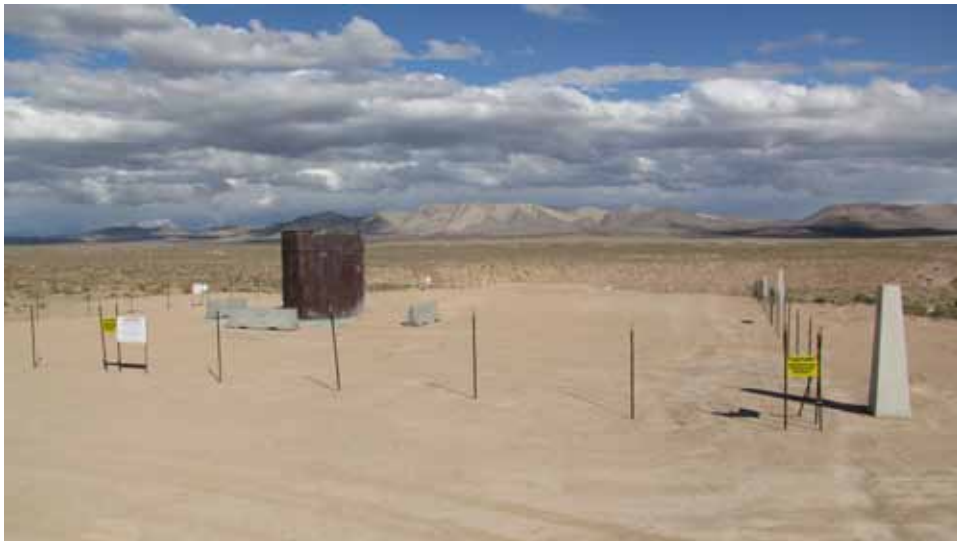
CAS 02-37-02 (MULLET), Placement of Jersey Barrier, Looking Southwest, 09/26/2011
